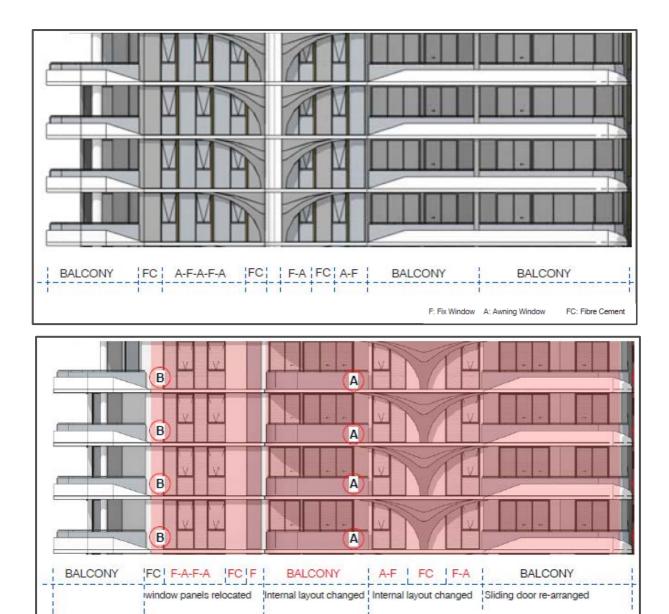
| Building 1 façade comparison of northern elevation: approved (above) and proposed (below) (source: SSD 9403 Approved Plans and Applicant's RtS)
